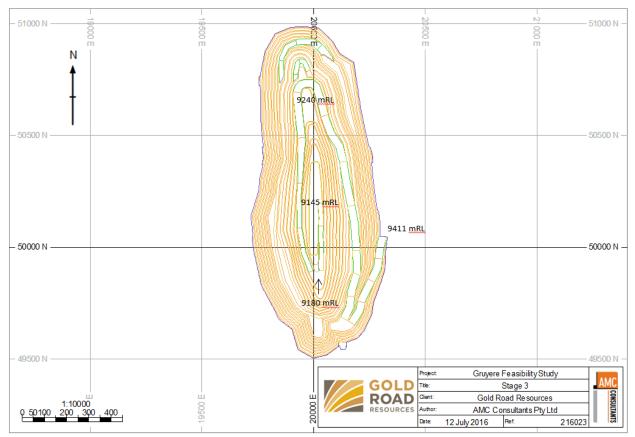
Plan View Showing Stage 3 of the Pit Design (Gruyere Grid)
